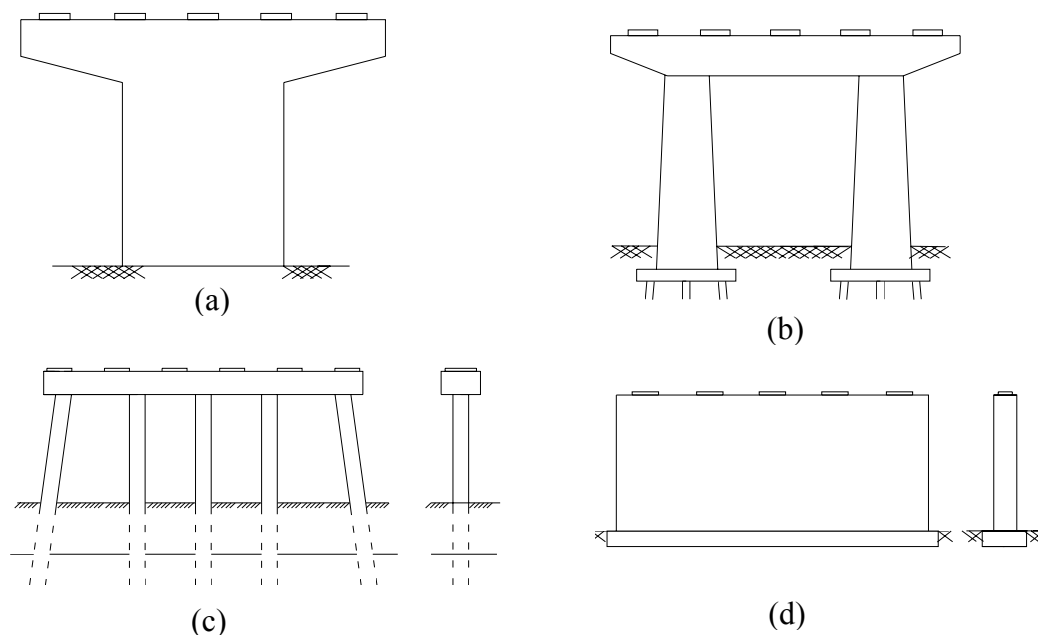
Different types of piers. (a) Hammerhead (b) Column Bent (c) Pile Bent (d) Solid Wall
